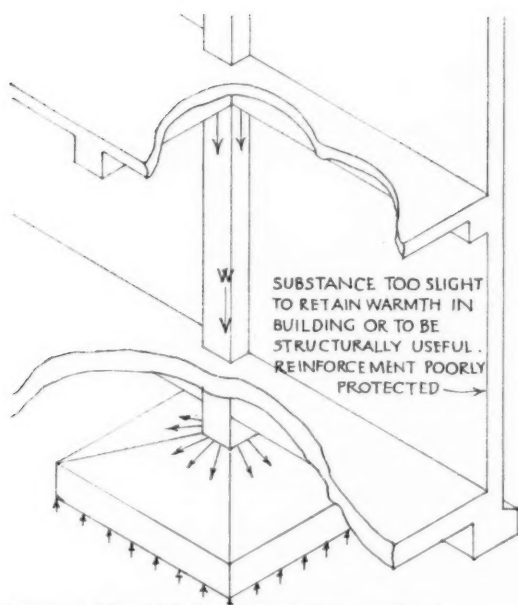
ARTICULATE SKELETON SYSTEM. BEYOND A CERTAIN POINT THINNING DOWN THE WALL SAVES VERY LITTLE. PRESSURES COLLECTED AND CONCENTRATED BY GIRDERS & PIER MUST BE SPREAD AGAIN BY COSTLY FOUNDATIONS.
